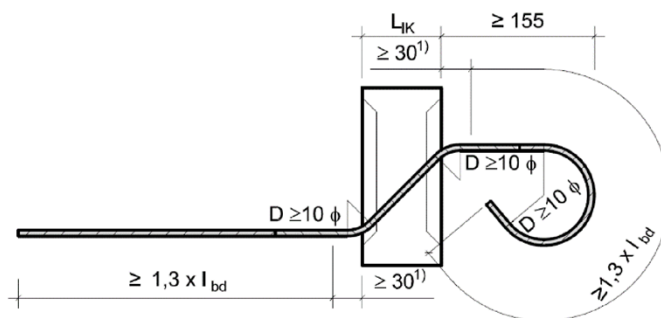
Shear force bar for Schöck Isokorb® Type Q with bent bar end on the ceiling side
